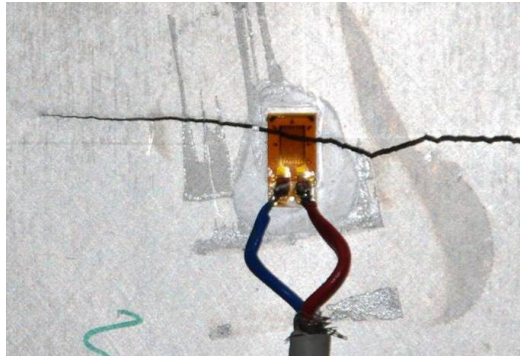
Fatigue crack crossing the strain gage opposite to the stiffener.
